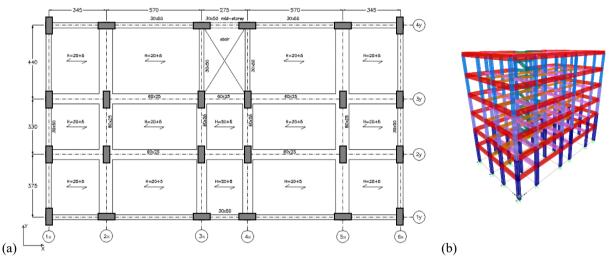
(a) Building plan and (b) 3D FEM model of the building structure made in SAP2000.
